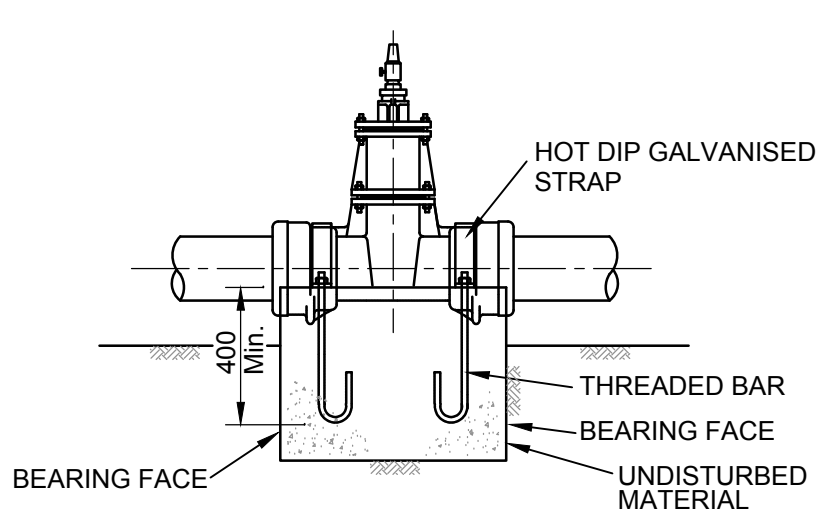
DETAIL OF CONCRETE PIER (SEE NOTE 9)
